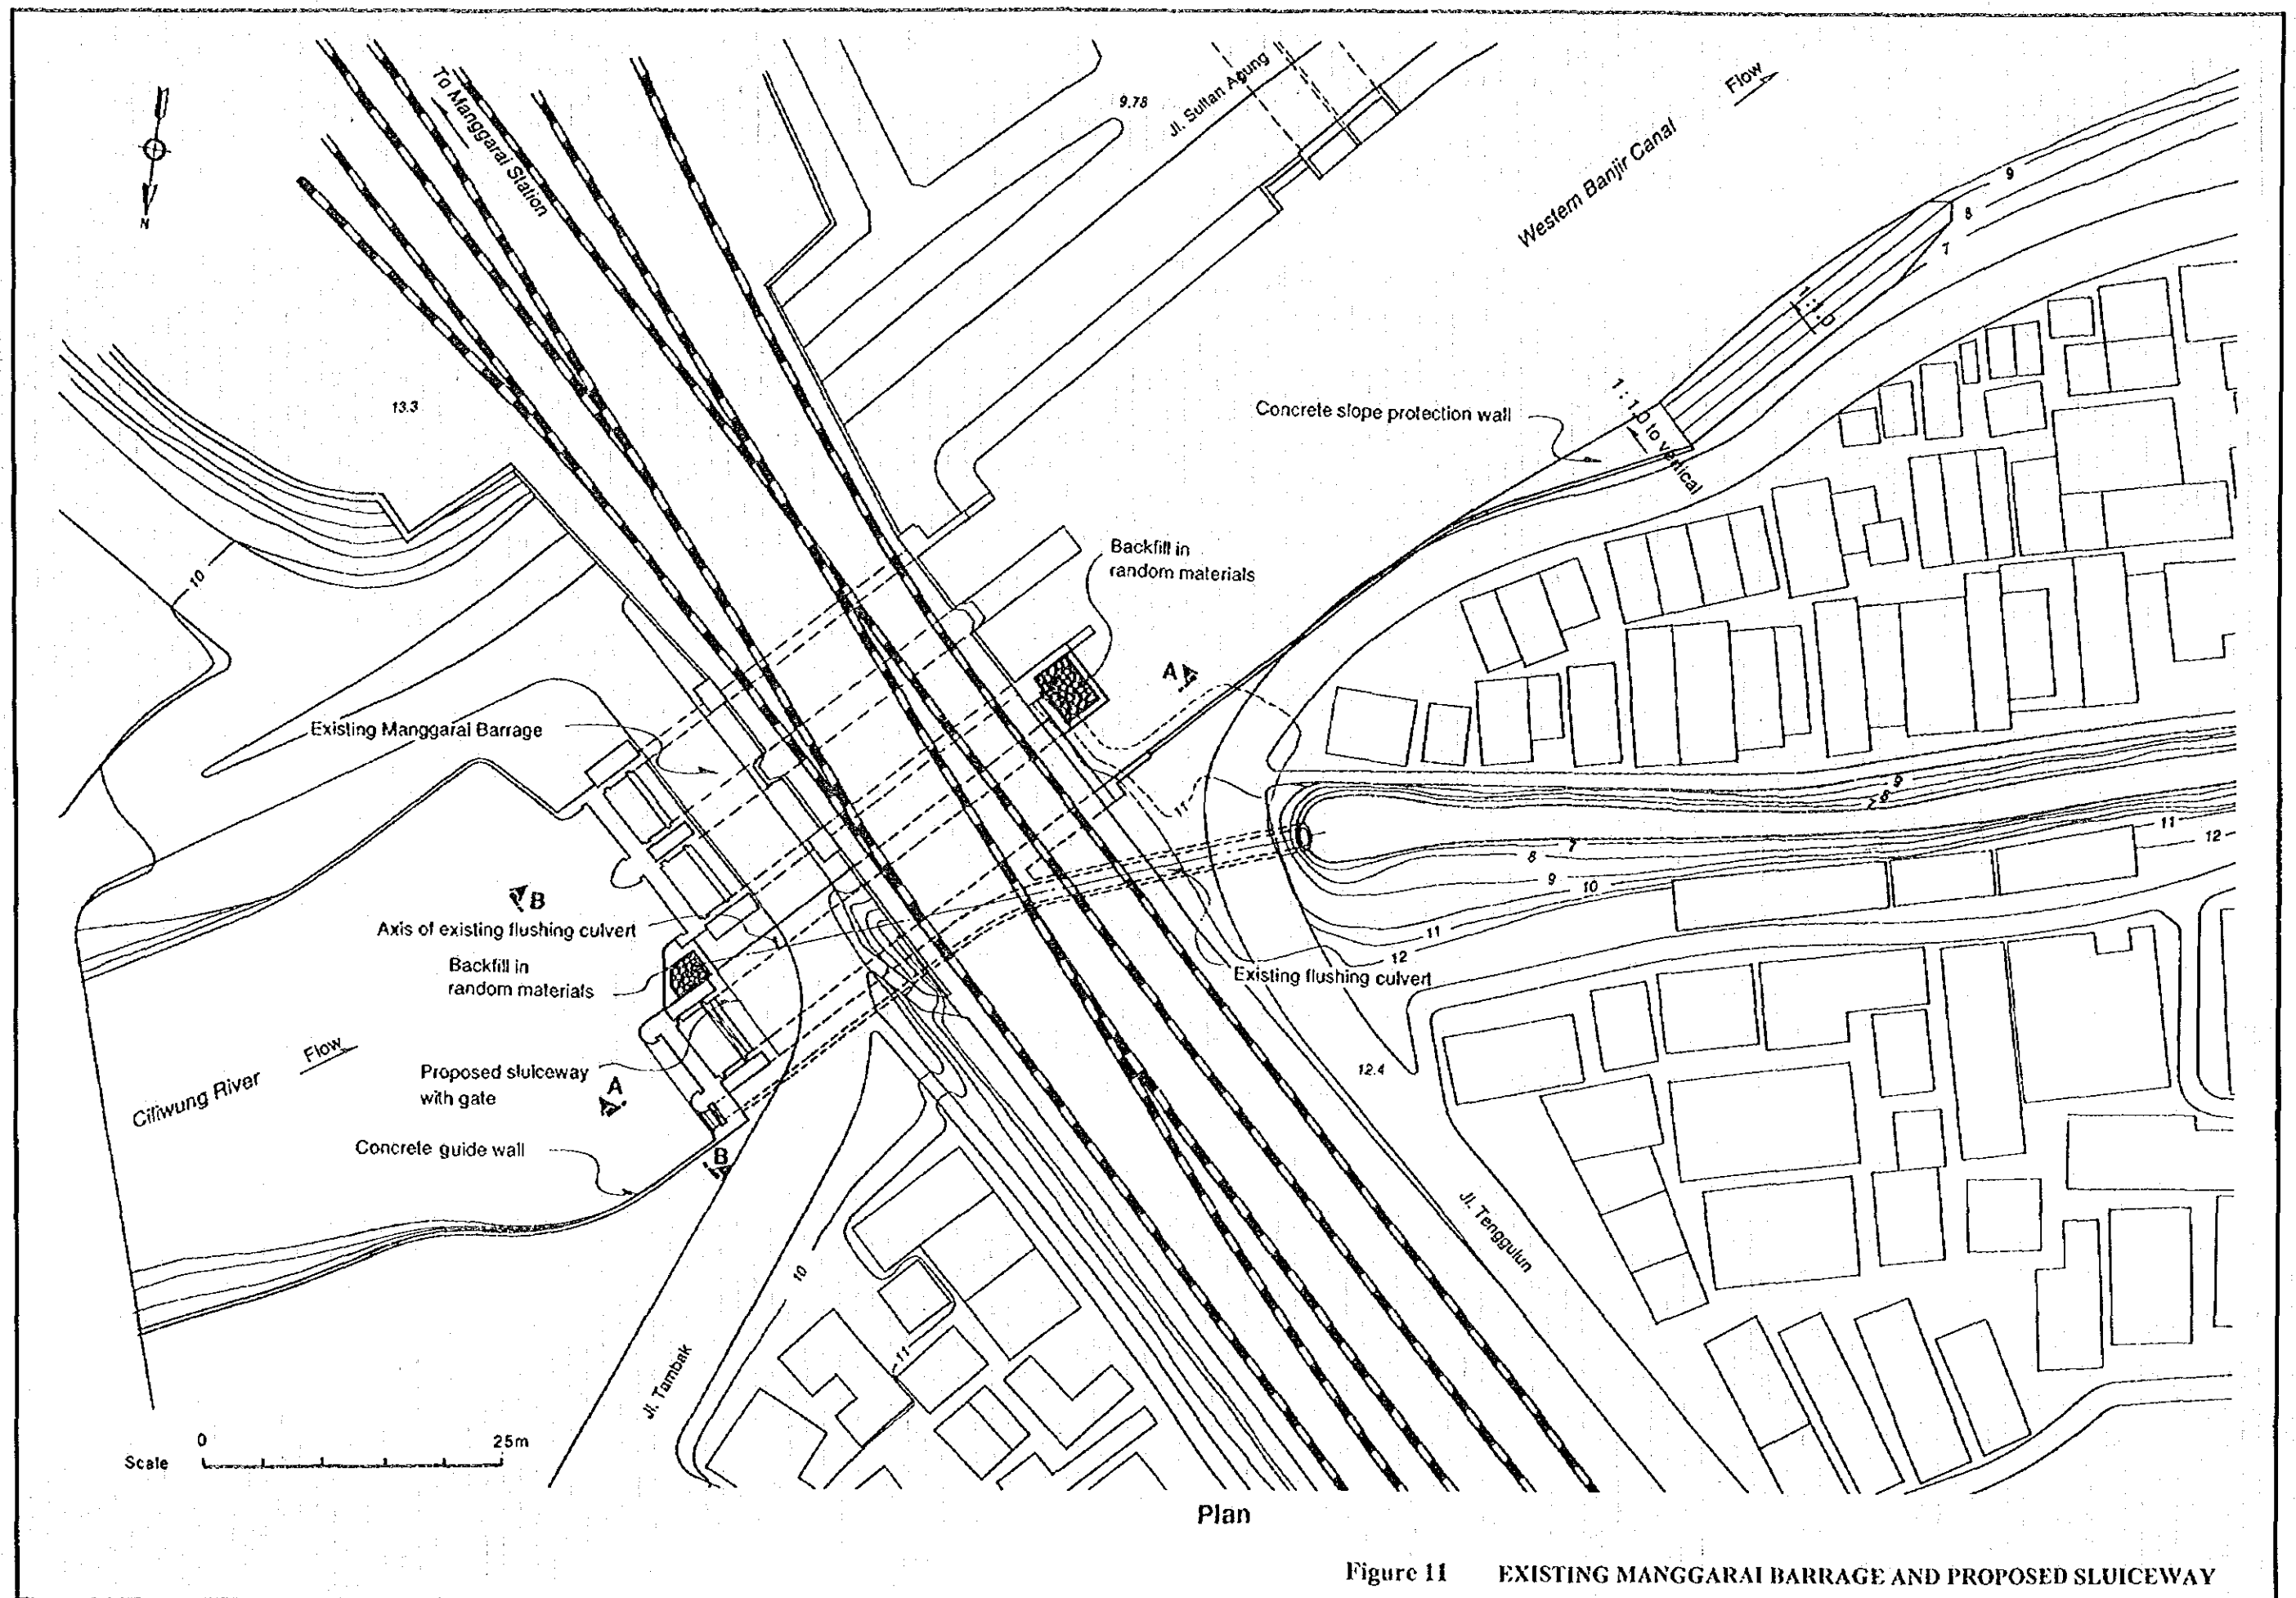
EXISTING MANGGARAI BARRAGE AND PROPOSED SLUICEWAY
